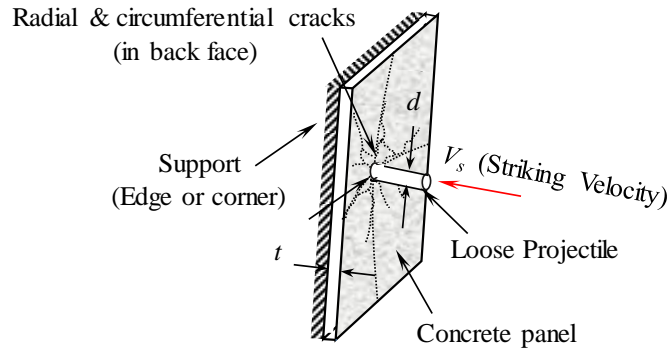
Cracking due to projectile impact on concrete panel.
